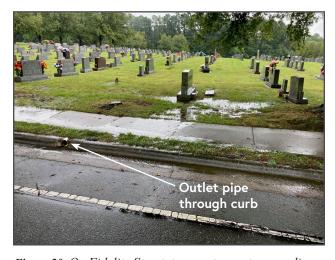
On Fidelity Street, tree roots create a ponding issue that could be resolved by connecting an inlet to the existing drain pipe. (CVDA)
